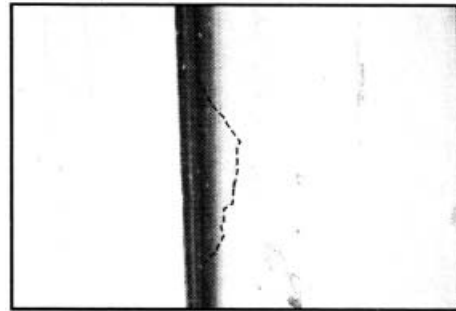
Slight crack at the edge of the wood-paneled south wall at the southeast corner at the first-floor level. The crack appears to extend the height of the wall. The photograph shows a vertical crack at the interface of the two perpendicular walls and a diagonal shear crack that extends down to the right (dotted line along crack).
